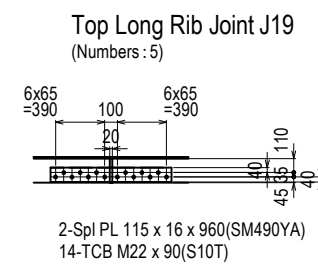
DETAIL OF MAIN GIRDER G1 (PF2-PF5) (19) S=1:80
